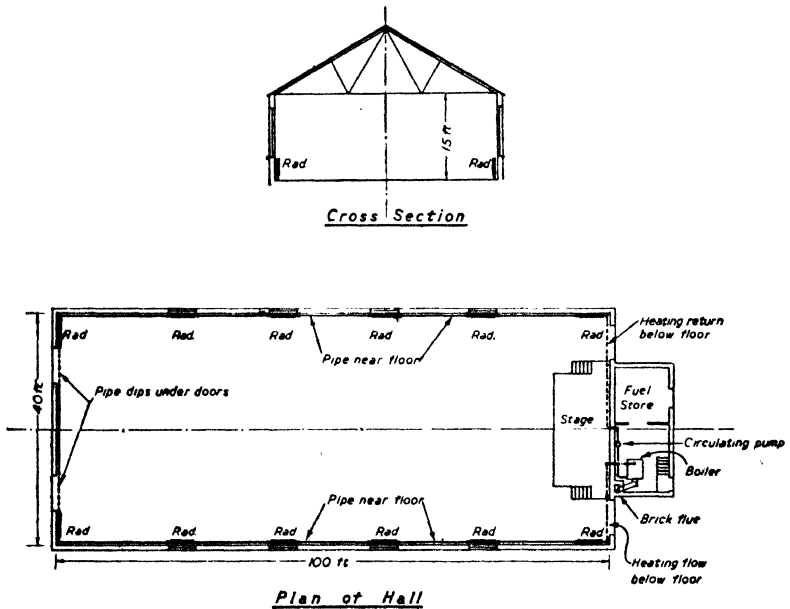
ASSEMBLY HALL SHOWING HEATING PLANT
